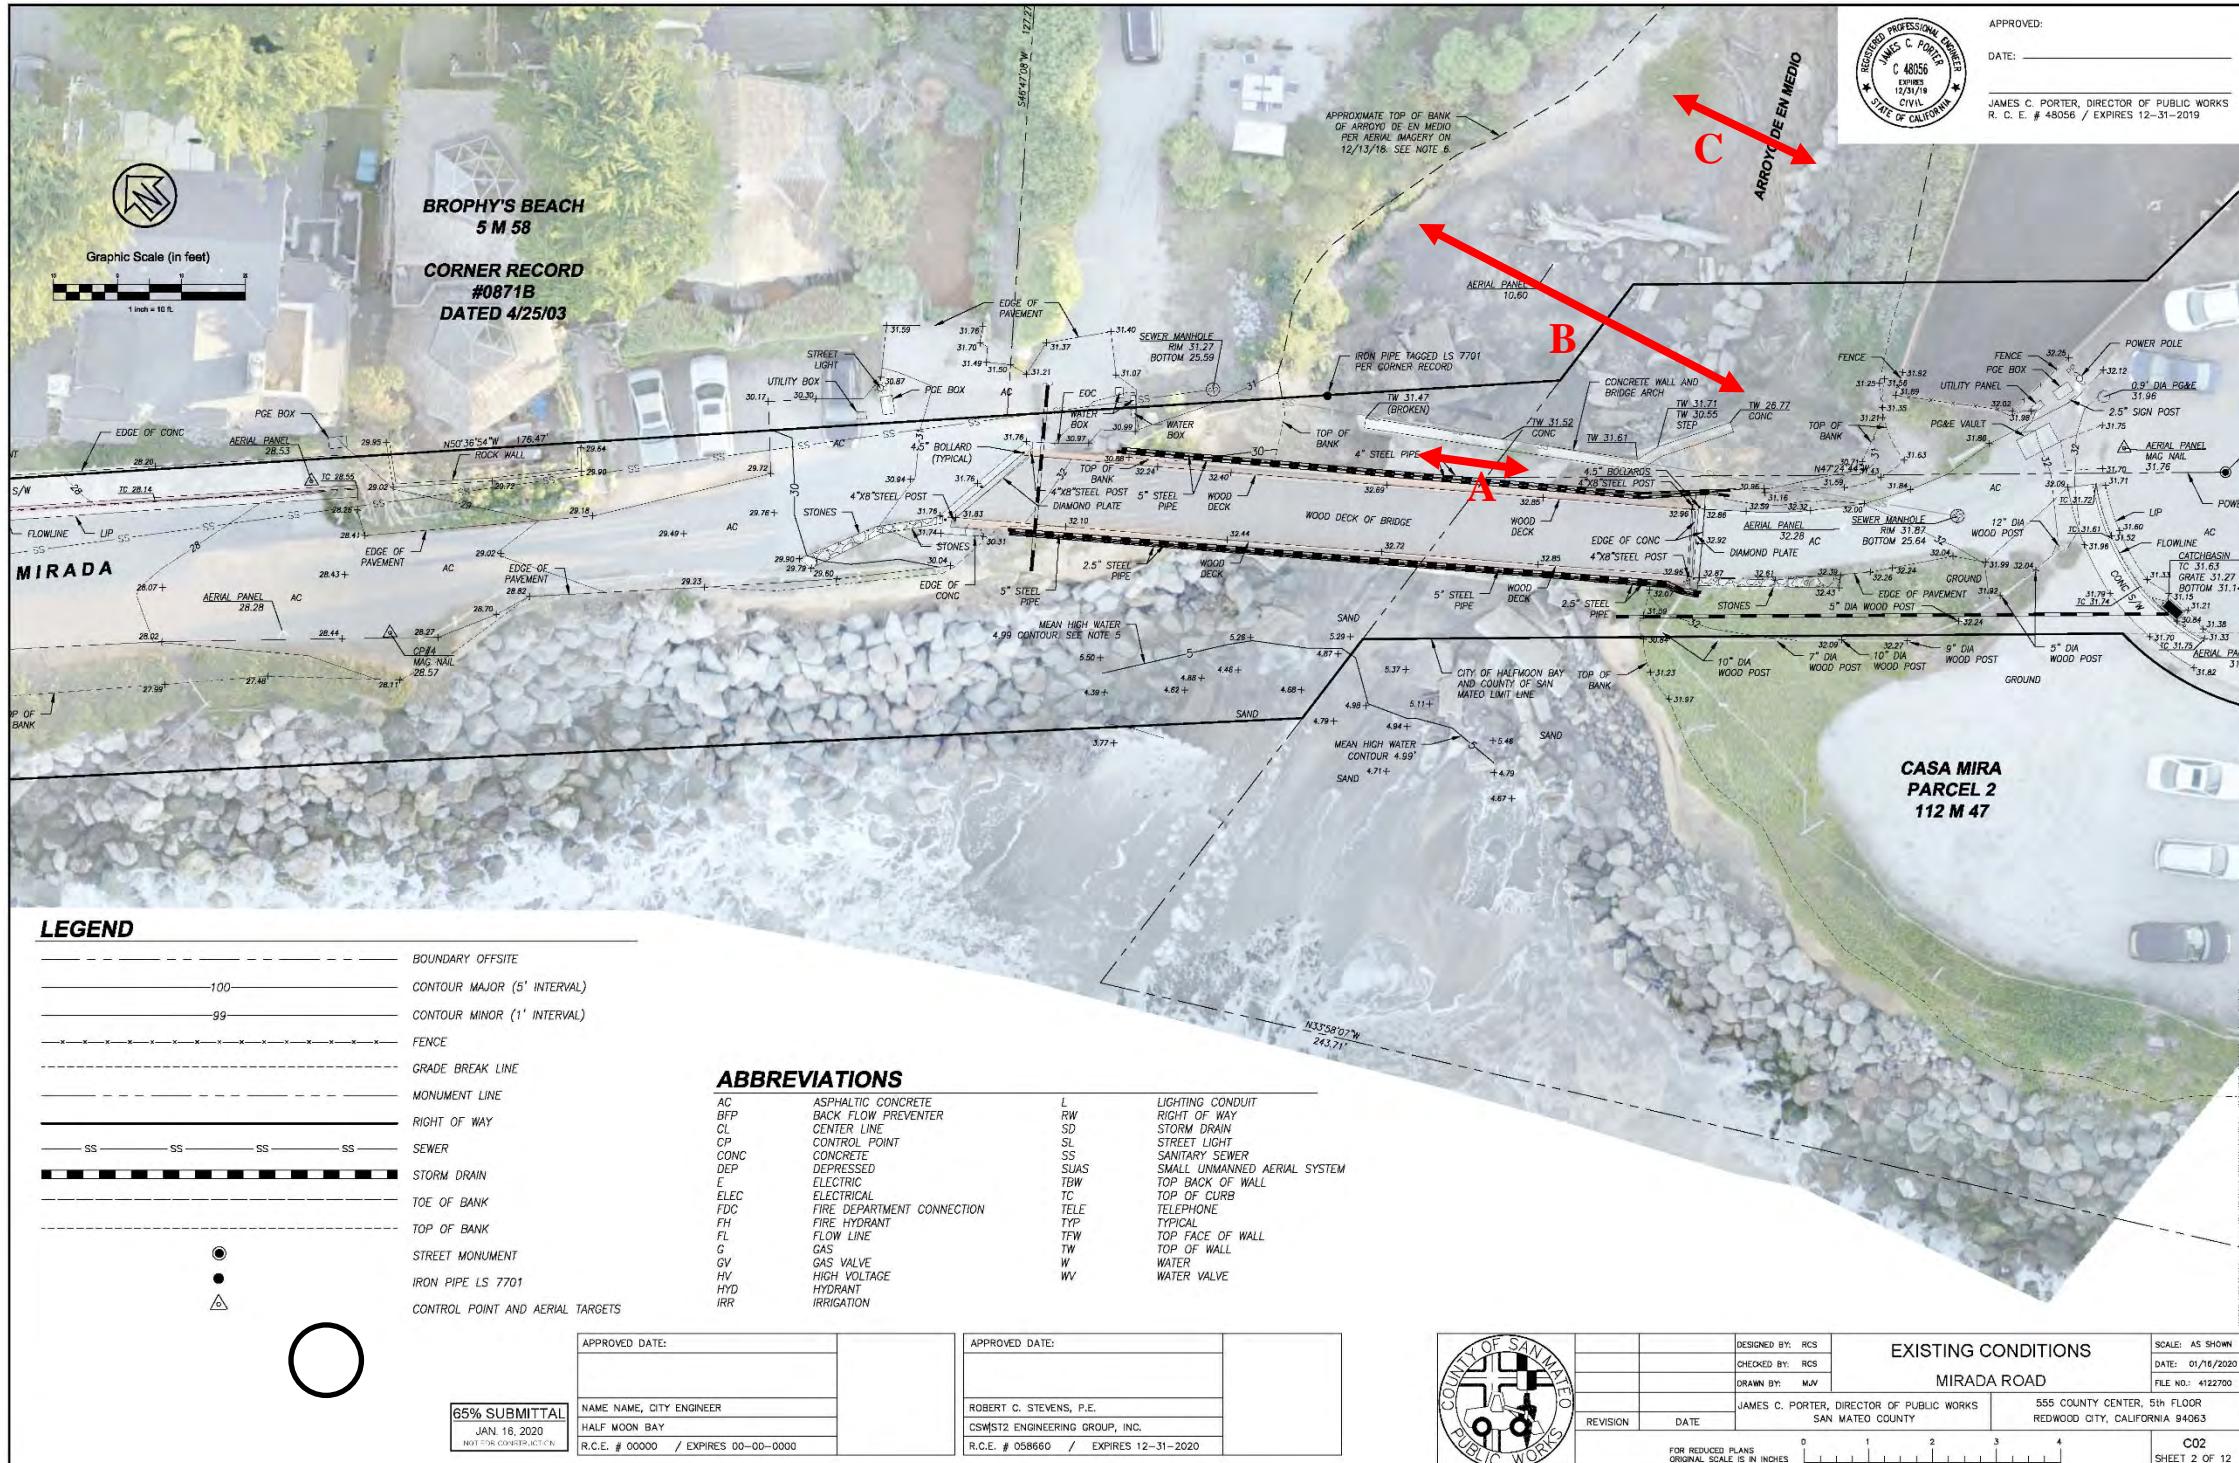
65% Existing Conditions Plan Sheet (with Markup in Red by WRECO).
